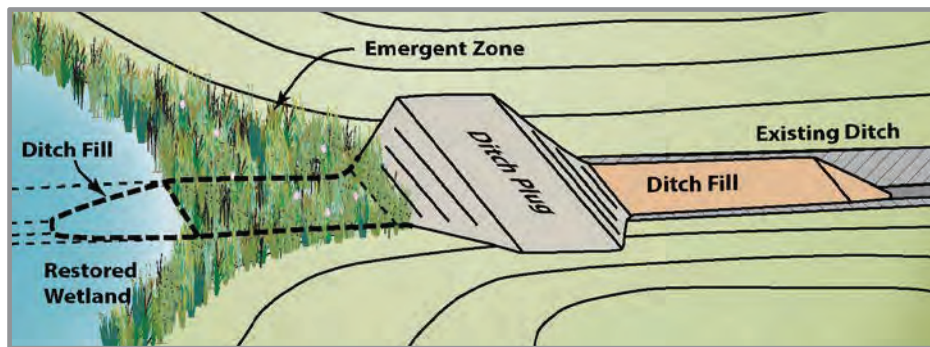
Ditch Plug Complimented with Adjacent Ditch Fills
